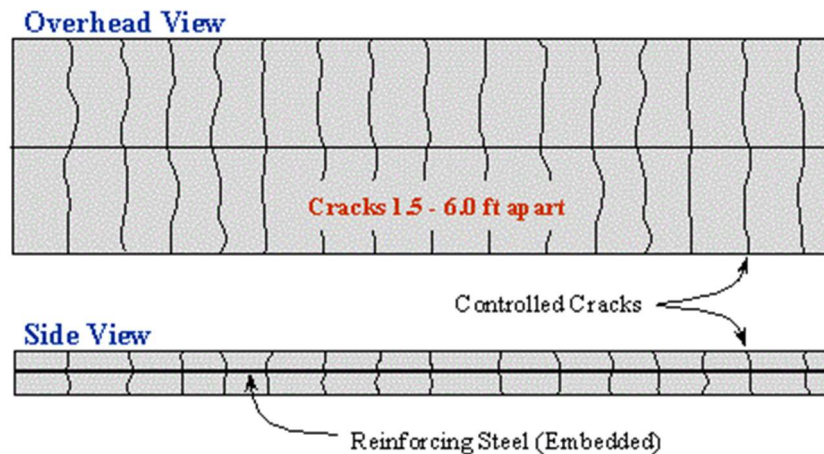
Cross-section and top view of Continuously Reinforced Concrete Pavement [78]
